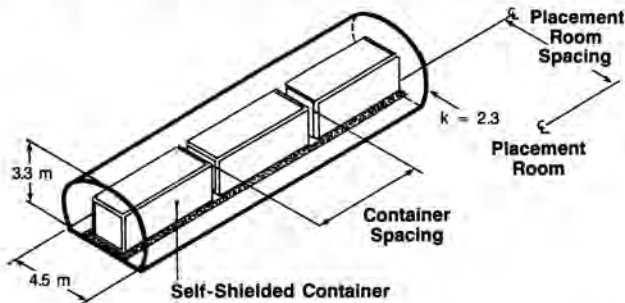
Alternative 11: General Arrangement - Self-shielded Container in Room.
